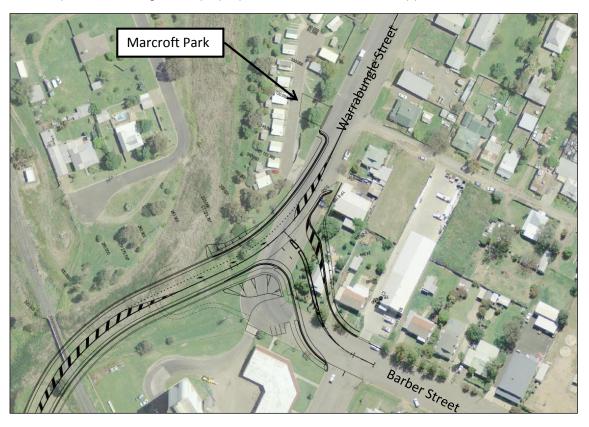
Barber Street intersection Source: KBR Pty Ltd
